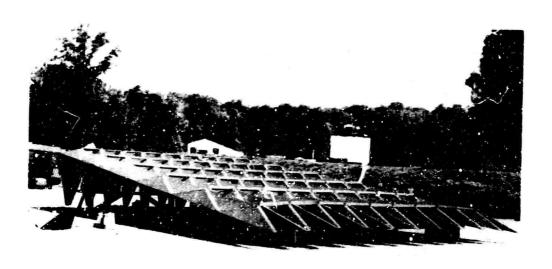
Flat roof complete – sidewall 40 percent complete.
